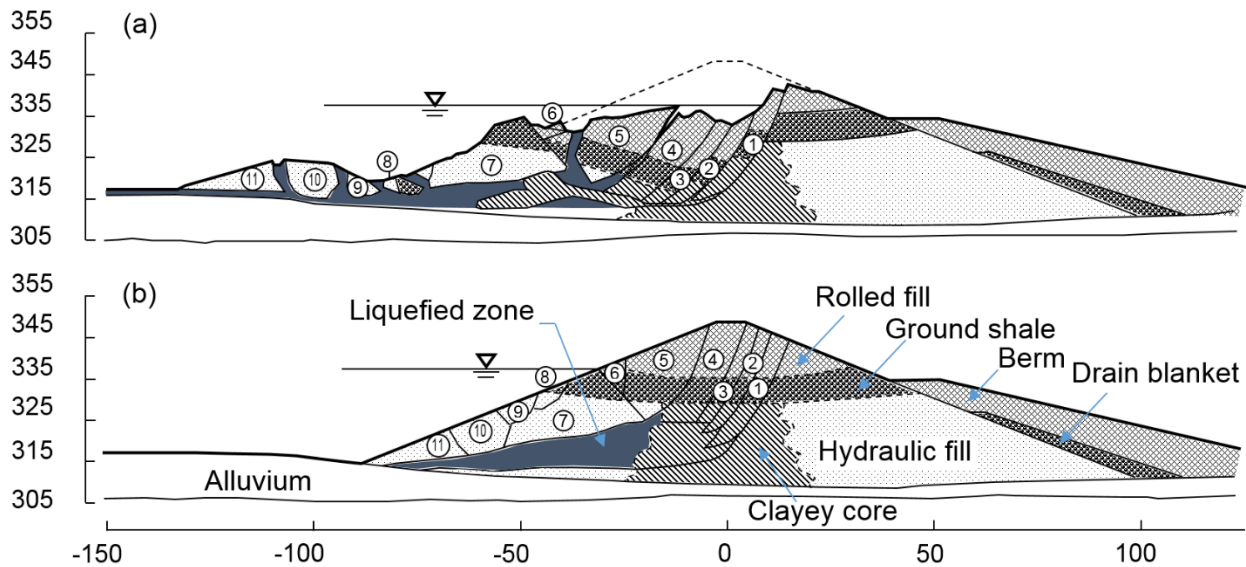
Cross-Section through the Lower San Fernando Dam: (a) after 1971 earthquake; (b) reconstruction of failed cross-section (Seed et al. 1973)
